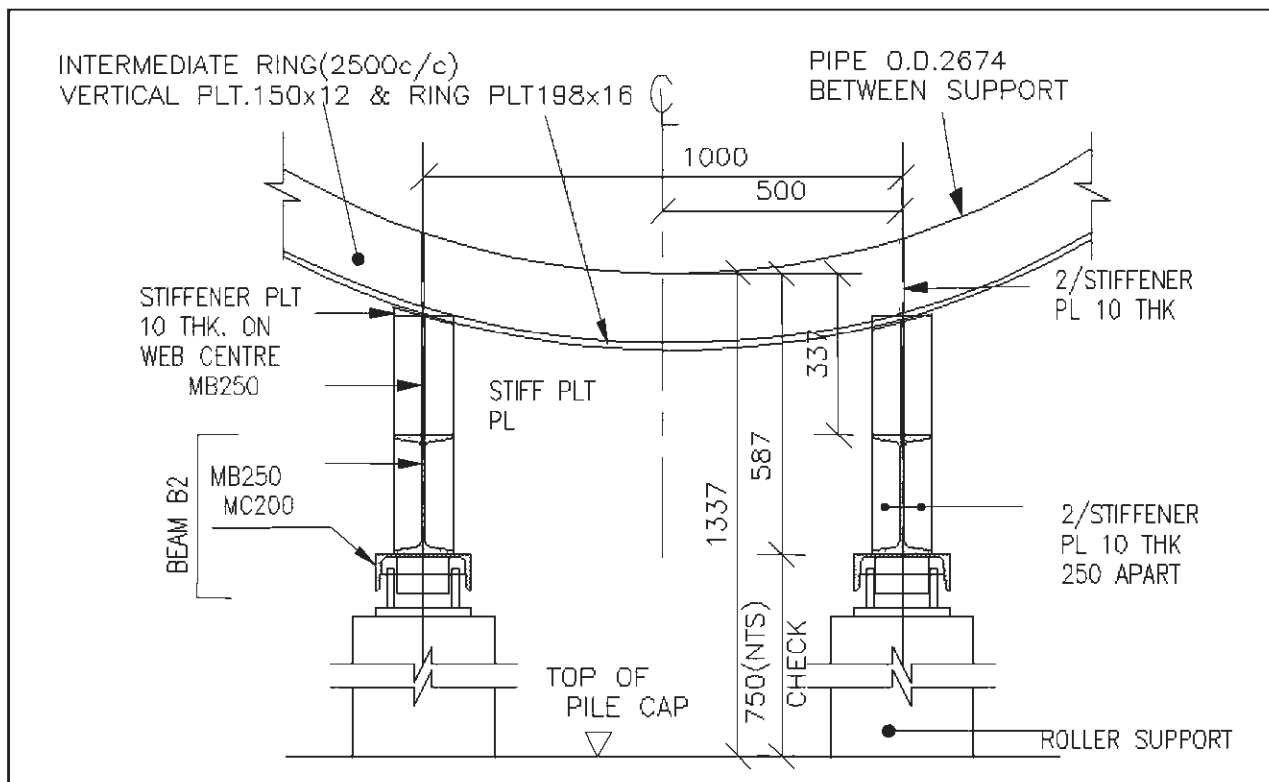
Details of Pipe Attachment for Rolling over Pile Caps (Intermediate T-Rings at 2.5 m c/c)
